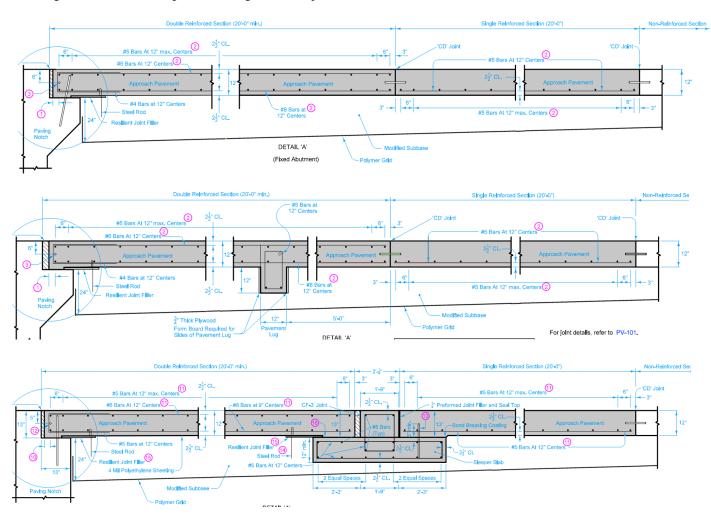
IowaDOT Approach Slab Design and Detailing
